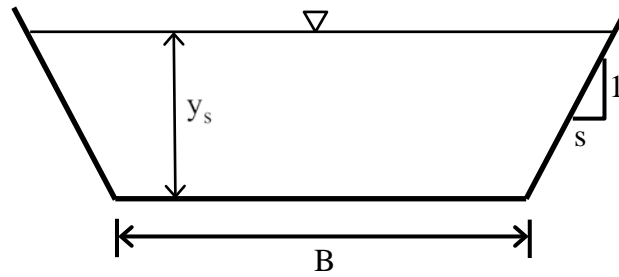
A trapezoidal channel cross-section and relevant parameters
